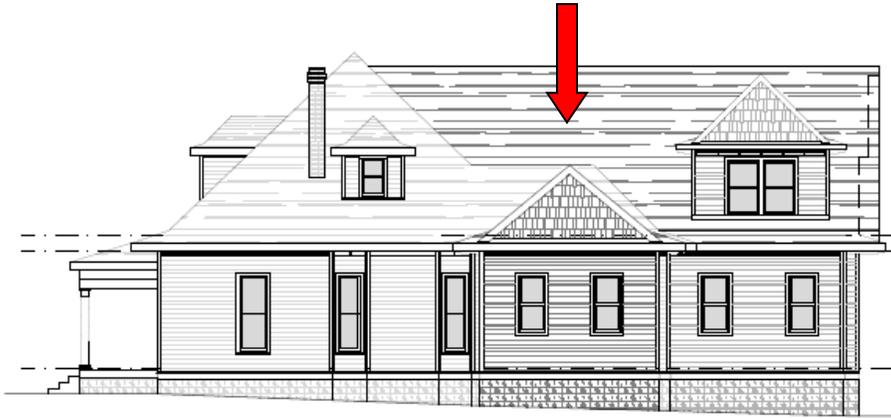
Proposed west elevation, arrow indicates one-story side addition.
